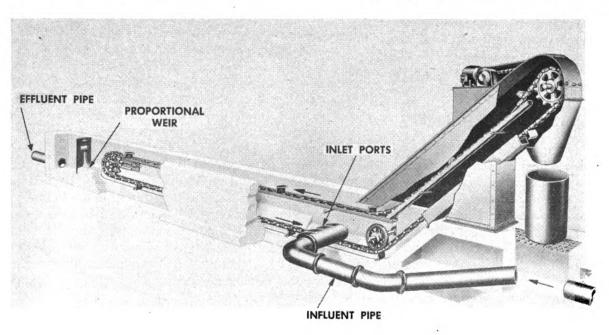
Grit chamber with conveyor type grit-removal mechanism.
